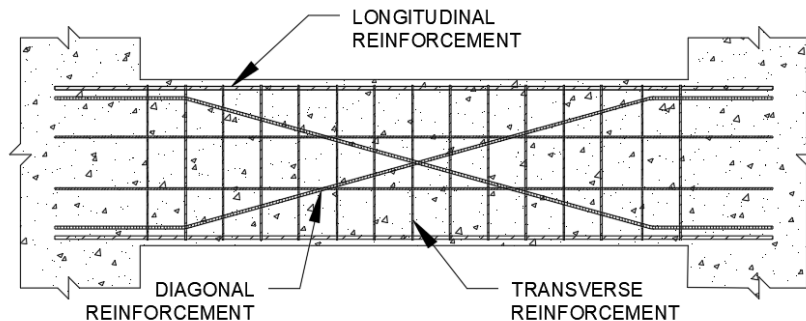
Coupling beams with hybrid layout (wall reinforcement omitted for clarity)
